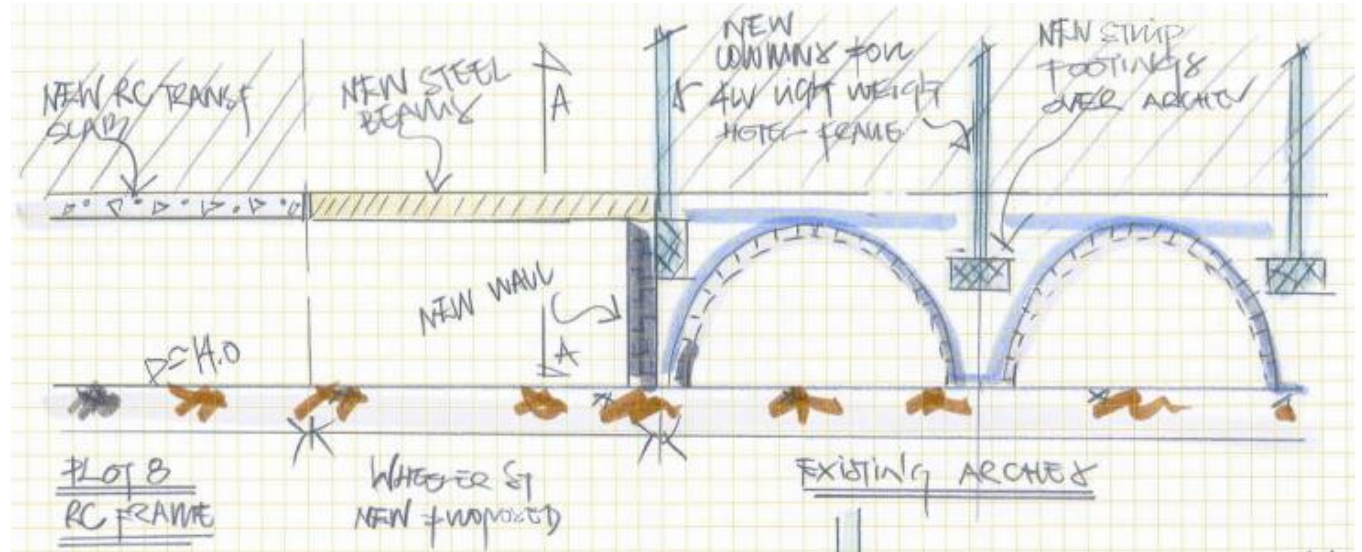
Section through Wheeler Street indicating new wall to the east and new decked structure over the street
